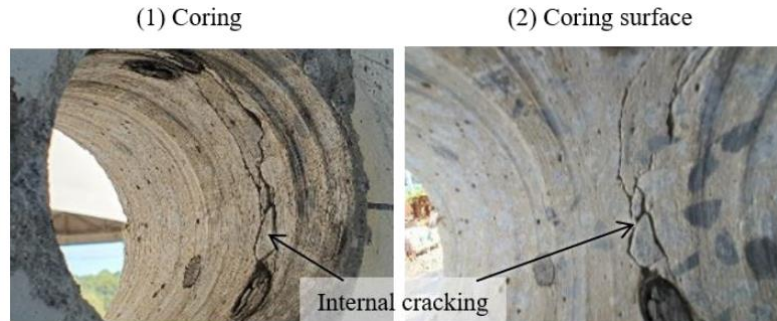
Internal cracks due to horizontal post-tensioning in semi-cylindrical specimens
